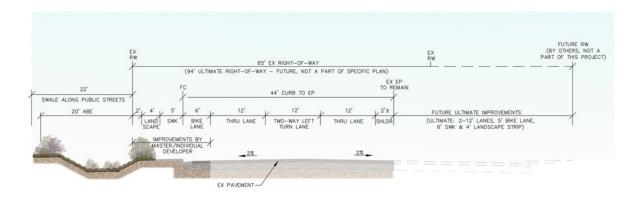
Proposed Harris Road, Northeast of Harris Place (no parking allowed)
